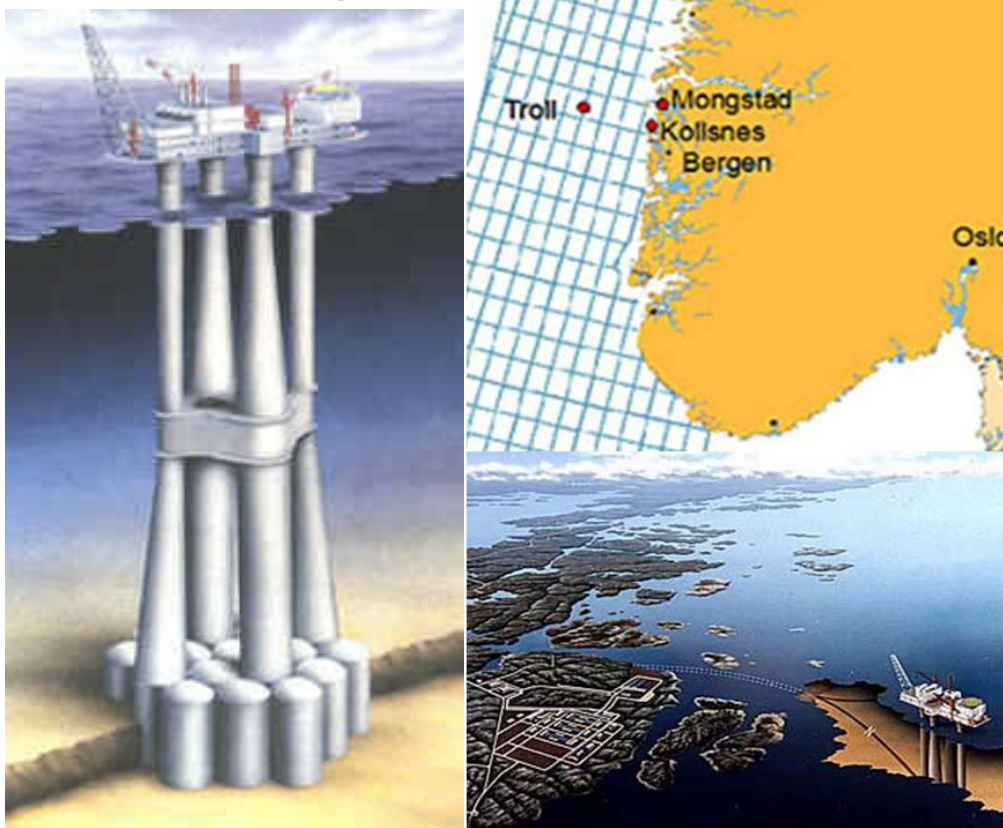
& 34 Troll A platform with limited gas processing equipment © Statoil
